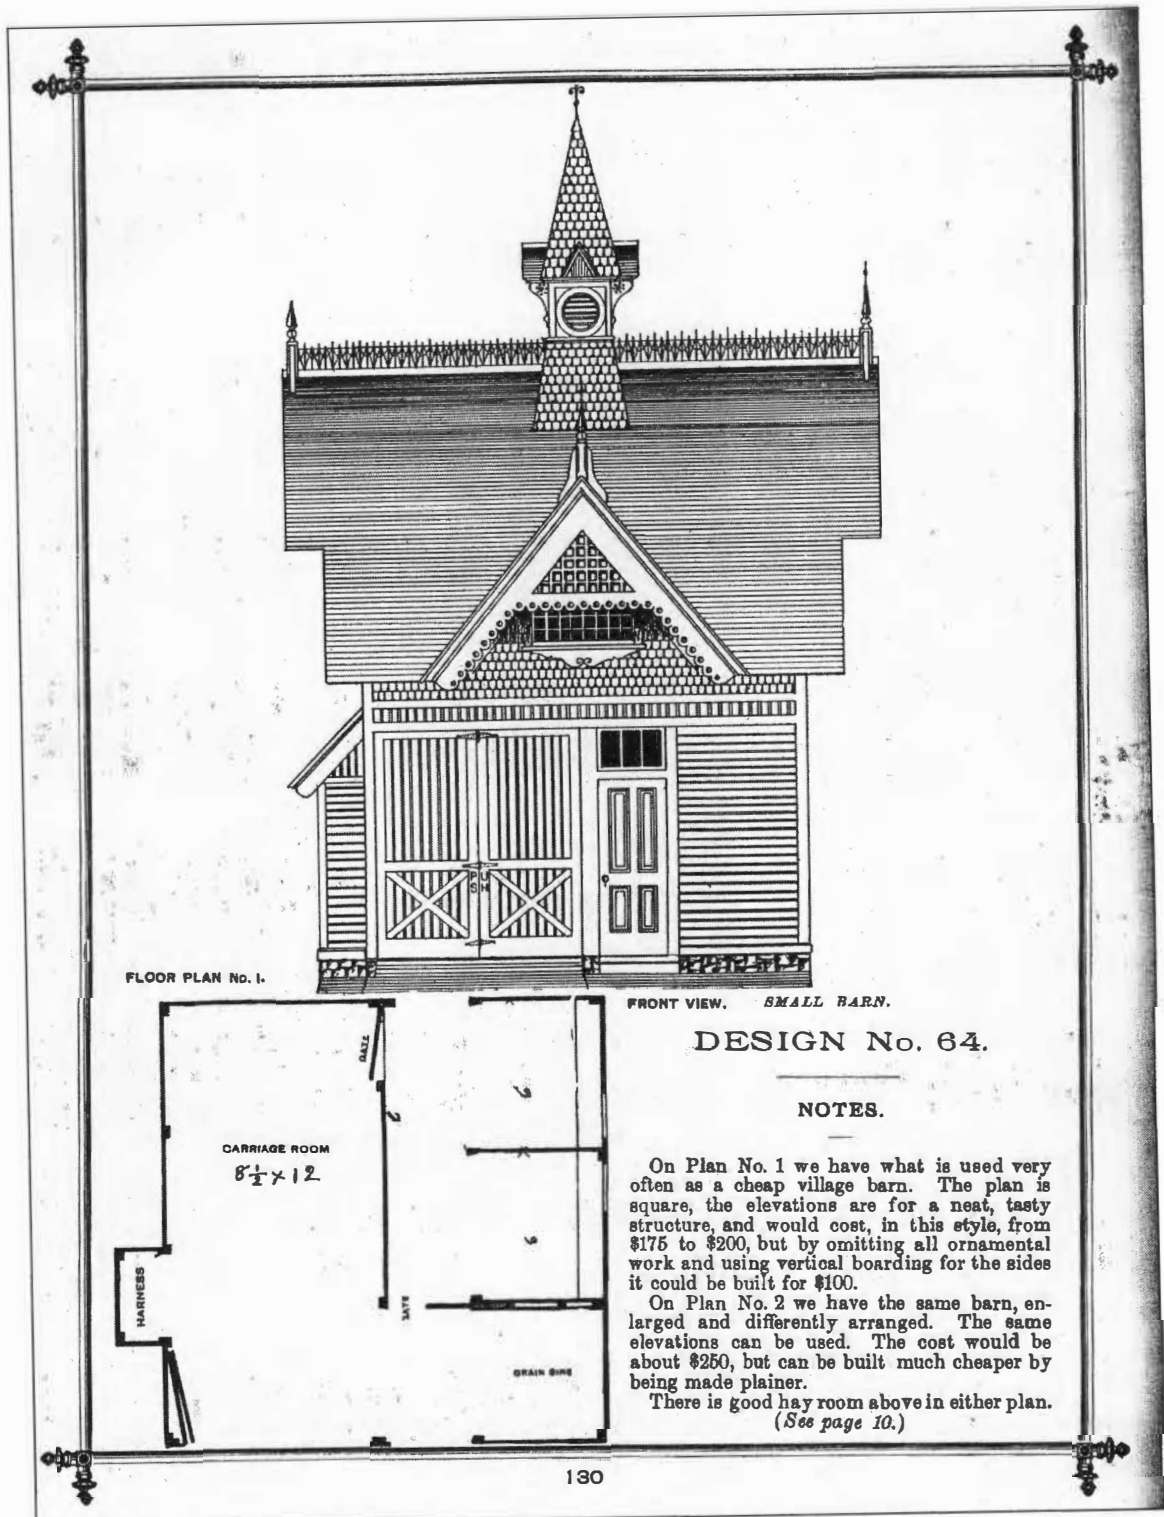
Design No. 64, front view and floor plan no. 1 (Barber 1891).
